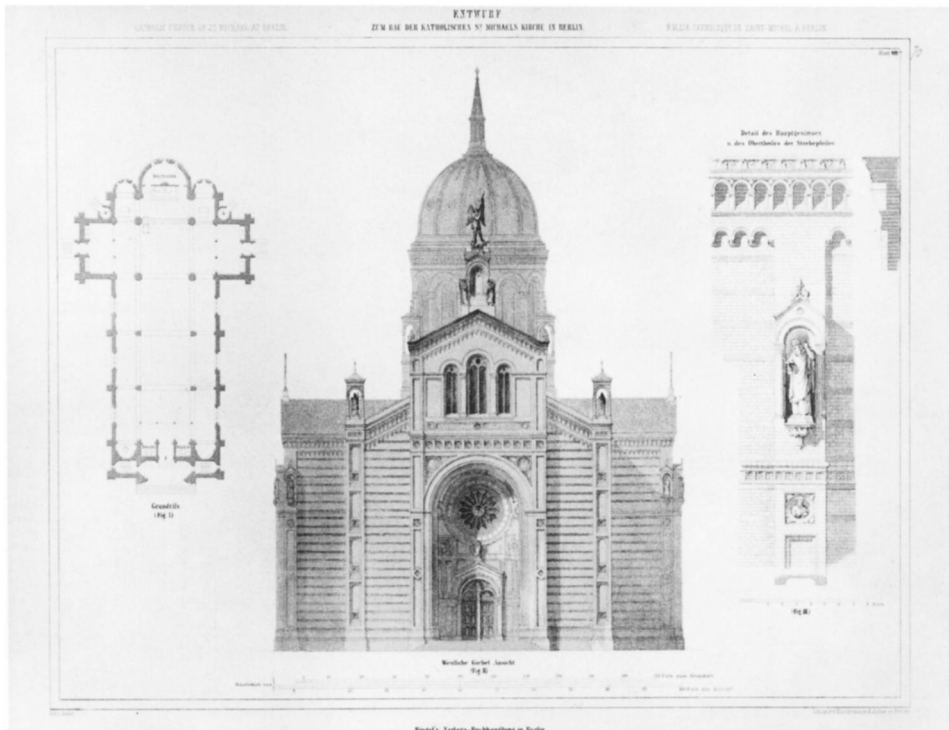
Soller, Michaelskirche, Berlin, 1845-1861, front elevation, plan, details (Königliche Technische Bau-Deputation, *Entwürfe zu Kirchen*, 1862 edition, Pl. 70; Architektursammlung, TU, Munich).
